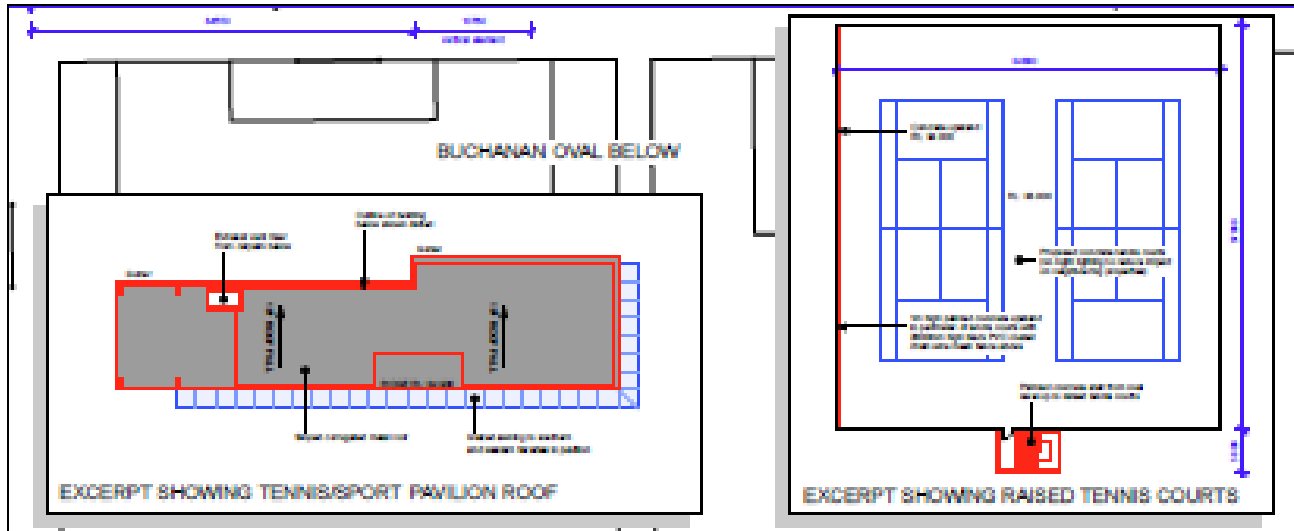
Roof of proposed tennis pavilion and raised tennis courts
